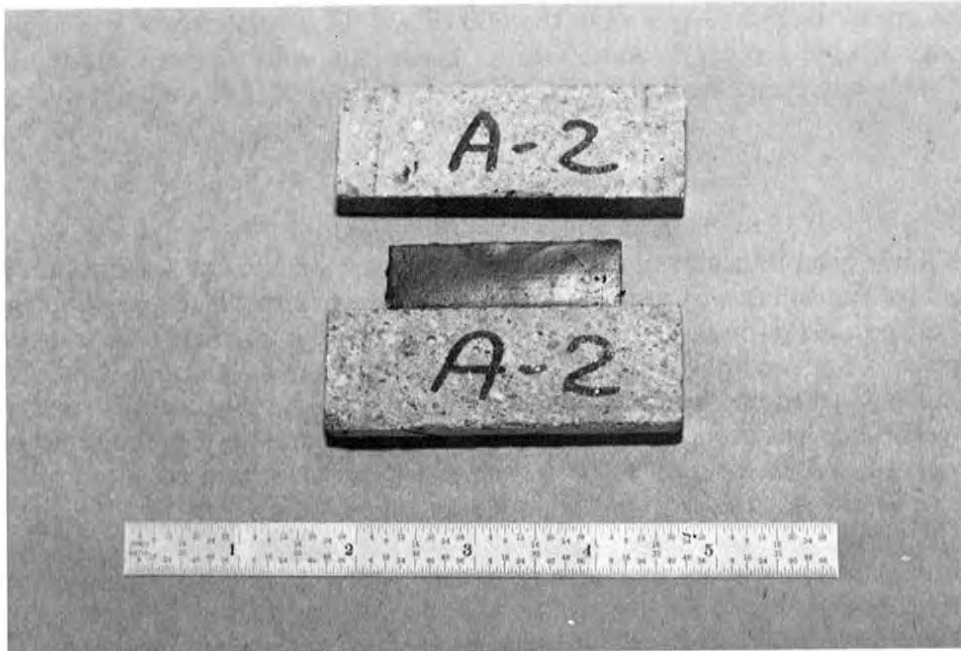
Adhesive failure—loss of adhesion between sealant and concrete block.
